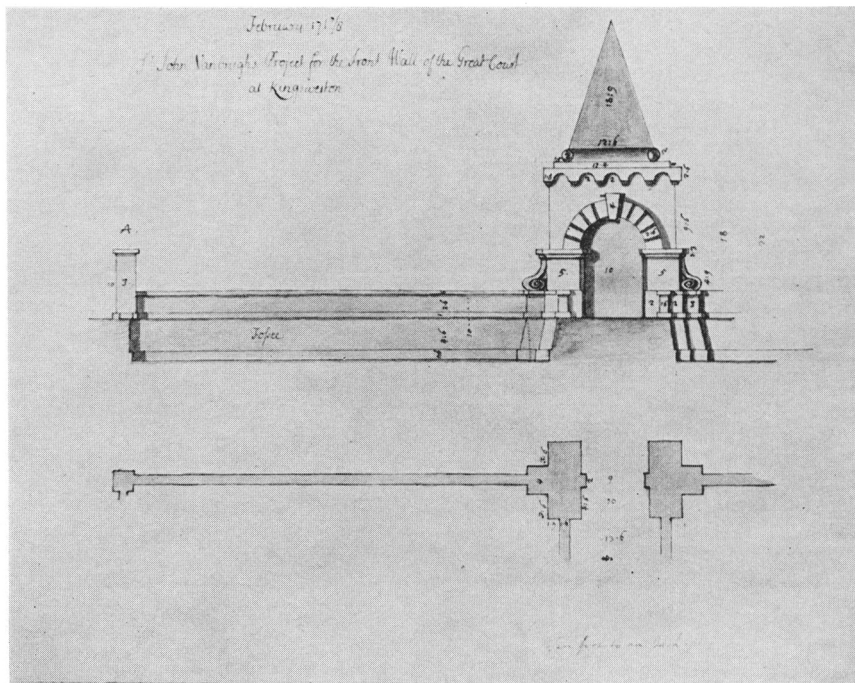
Plan and elevation of forecourt gate for Kings Weston [17]
